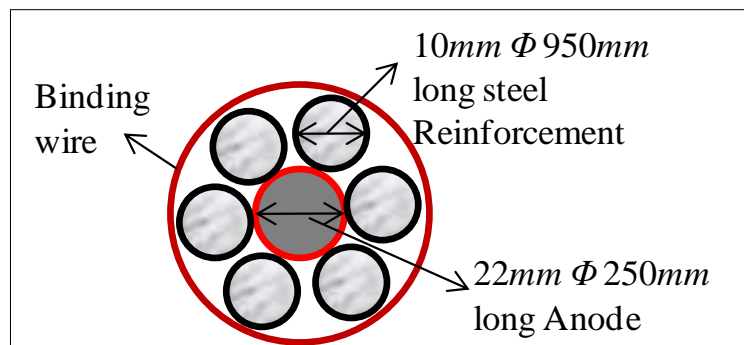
Cross-section of set-up for the test of bare steel reinforcement
